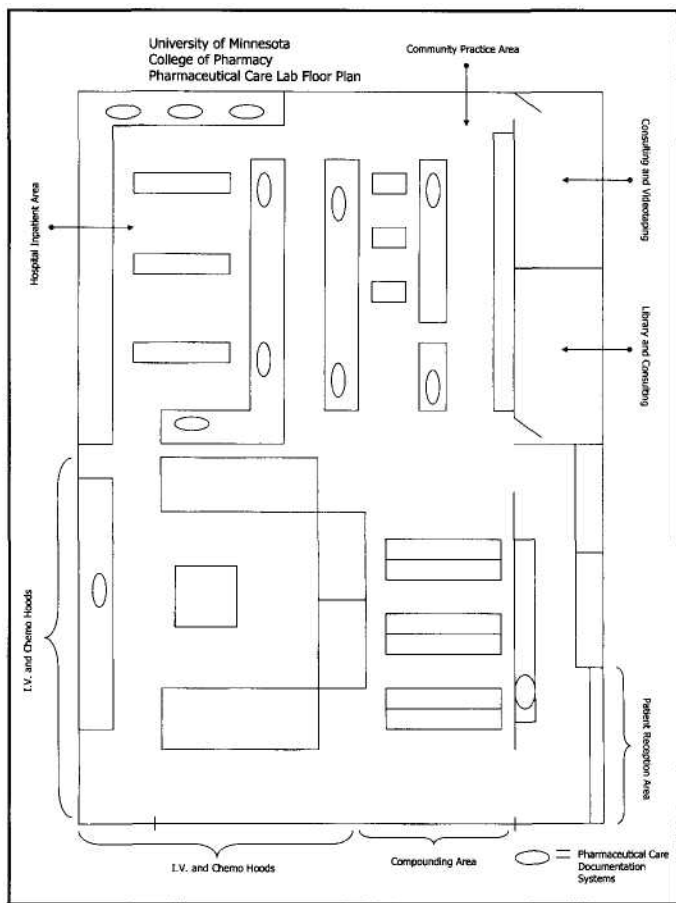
Pharmaceutical Care Laboratory floor plan.
